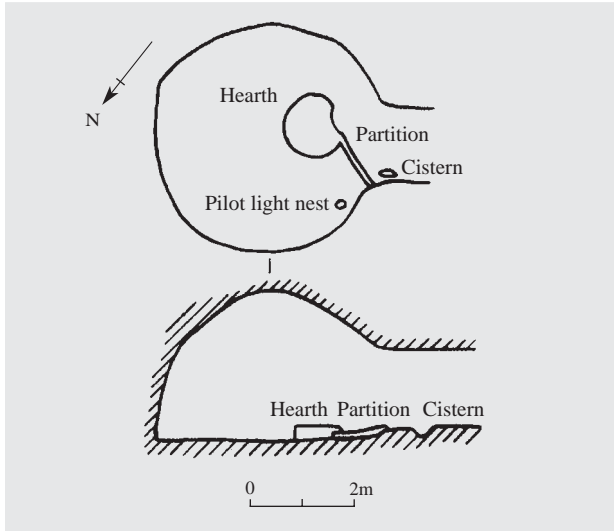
Plan and Section of Cave Dwelling F10 at Yanggua Site, Ningxian County, Gansu
